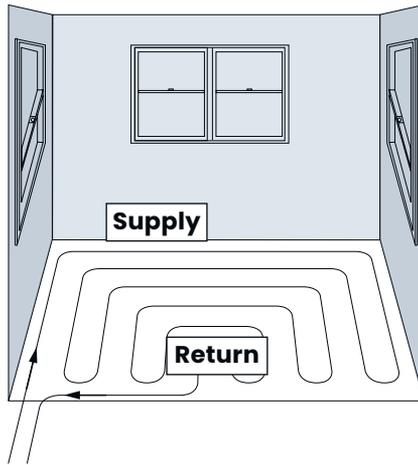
Triple-wall serpentine — Use when there are three walls representing the major heat loss of the room. The supply is fed along the heat loss walls in an alternating pattern and serpentine toward the lower heat loss area of the room. Start piping runs 6" from walls or nailing surfaces. A 6" on-center piping run is often installed along outside walls to improve response time.
